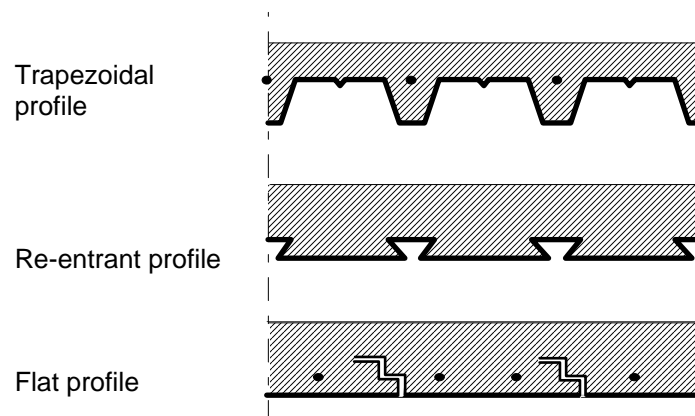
Typical examples of concrete slabs with profiled steel sheets with or without reinforcing bars
